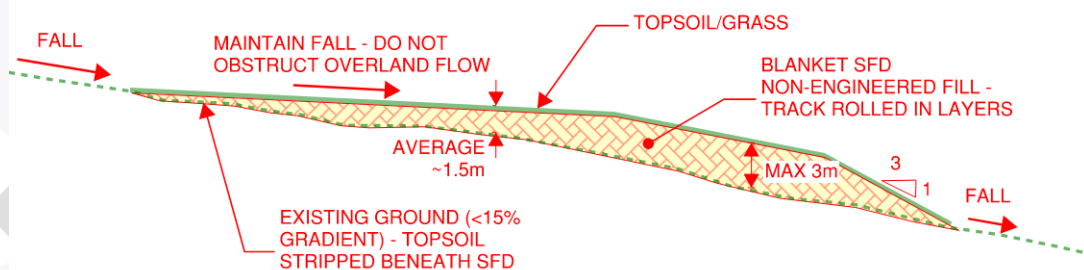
Blanket Type Surplus Fill Disposal Site – Typical Section
